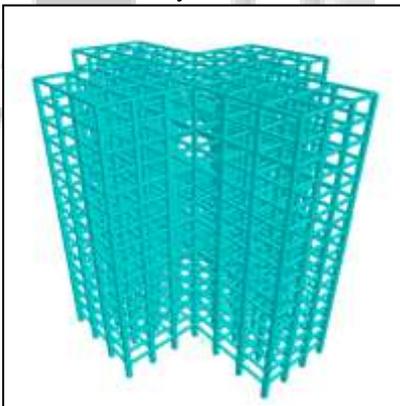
Plus Shape model 1 with arrangement of Bracing system
